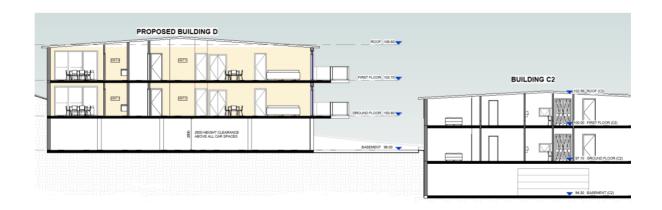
Section showing the building D, number of storeys, and parking level below natural ground level.
